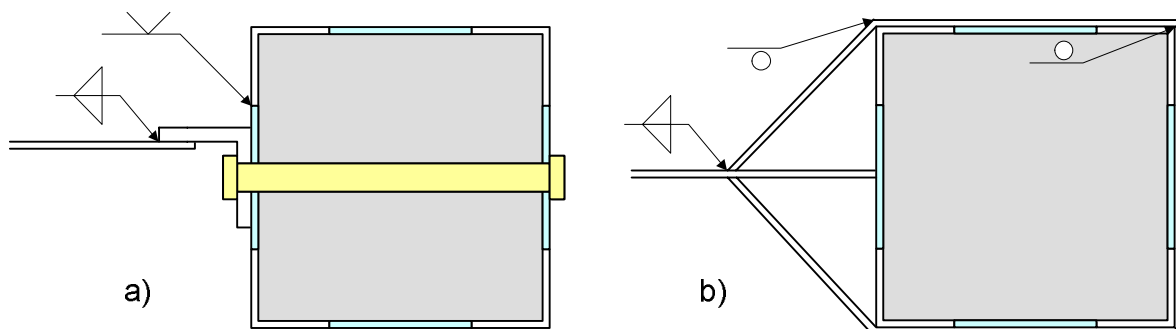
Alternative connection principle for the infill plate: a) anchored through the concrete column and b) tied with plate around the column.
